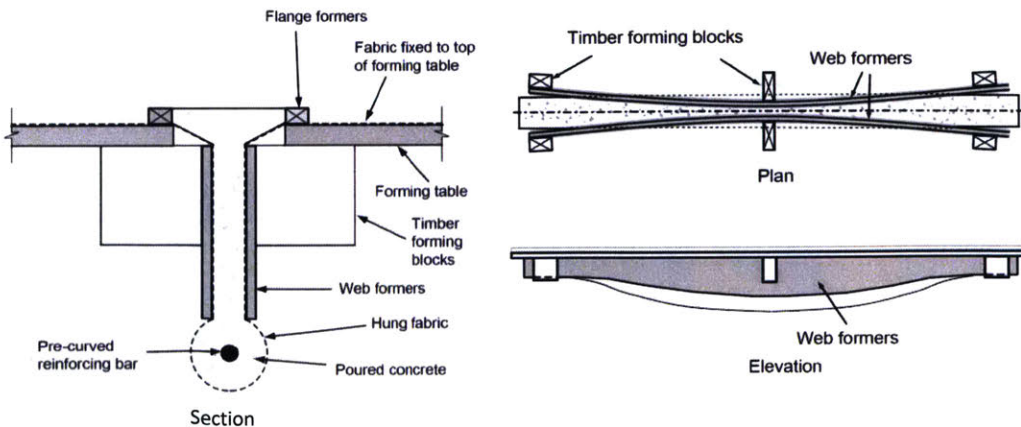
Section, Plan, and Elevation view of formwork for keyhole type beam, taken from Garbett et al. (2010)
